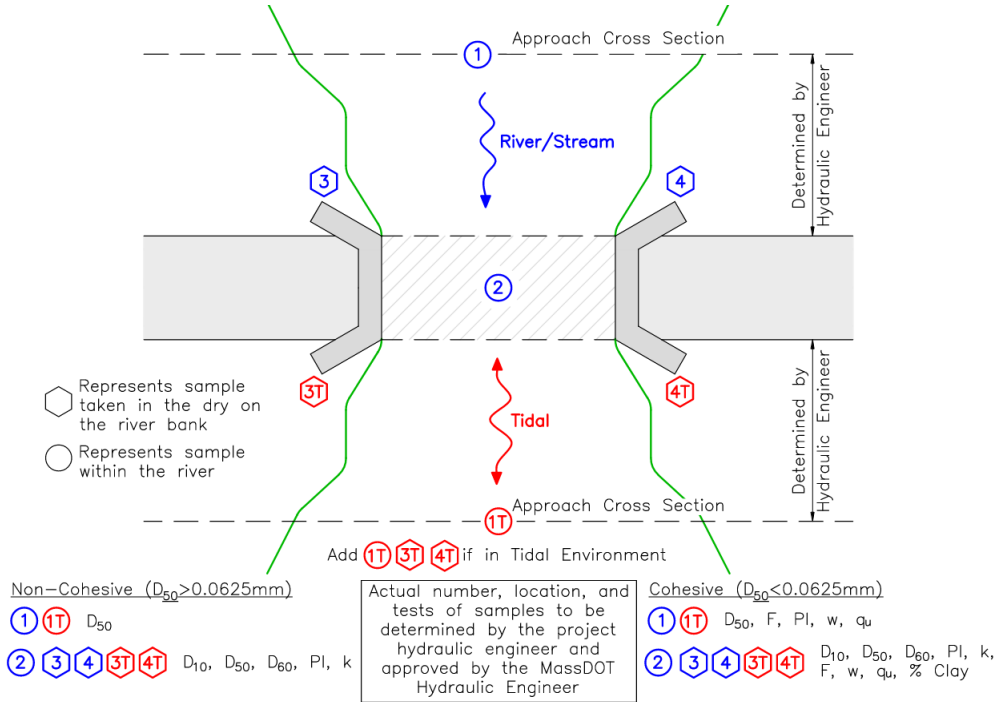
Single Span Bridge & Open Bottom Culvert in Riverine and Tidal Environment
